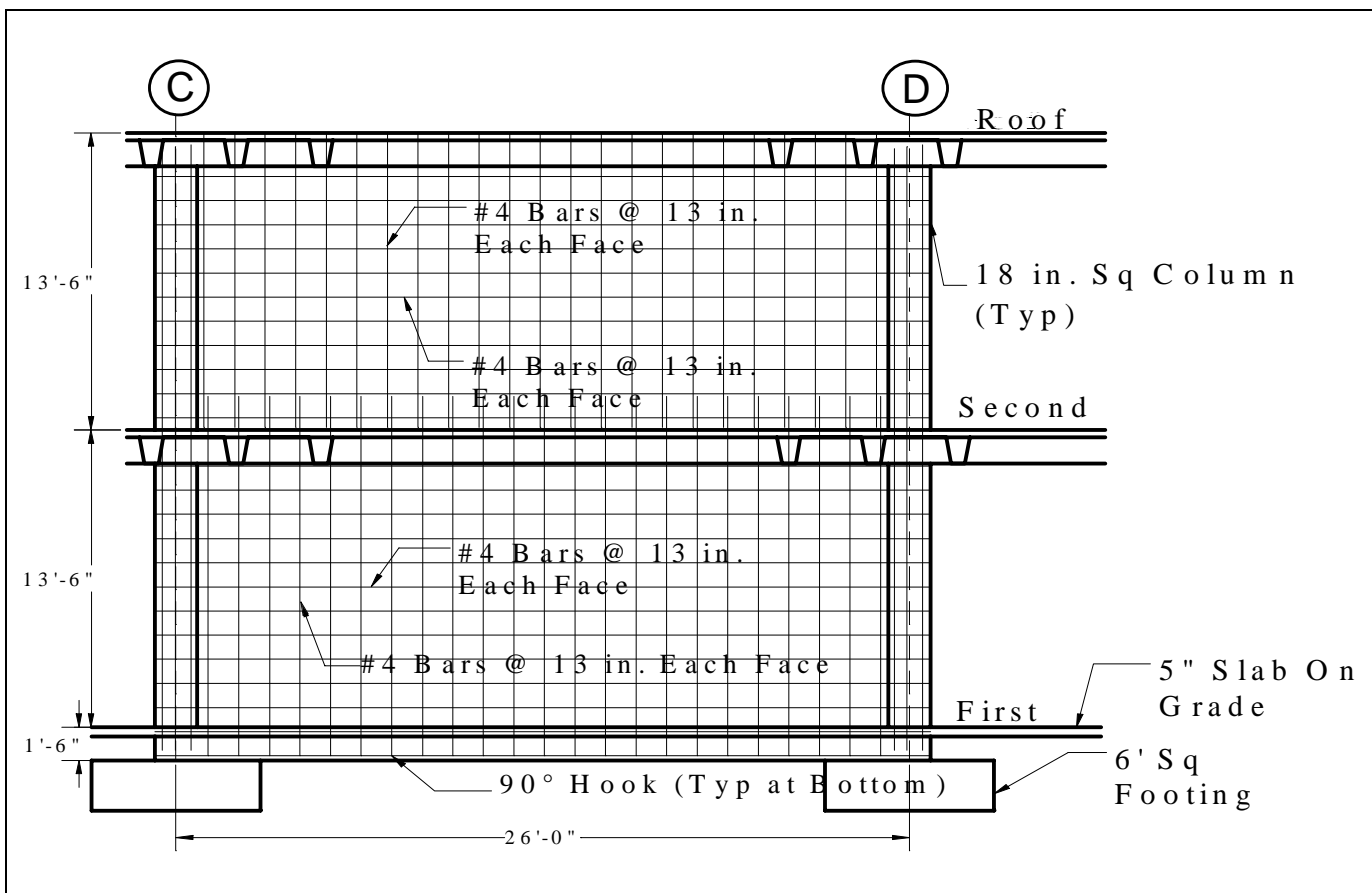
Example Solid Wall Detail (Condition at Line 7)
